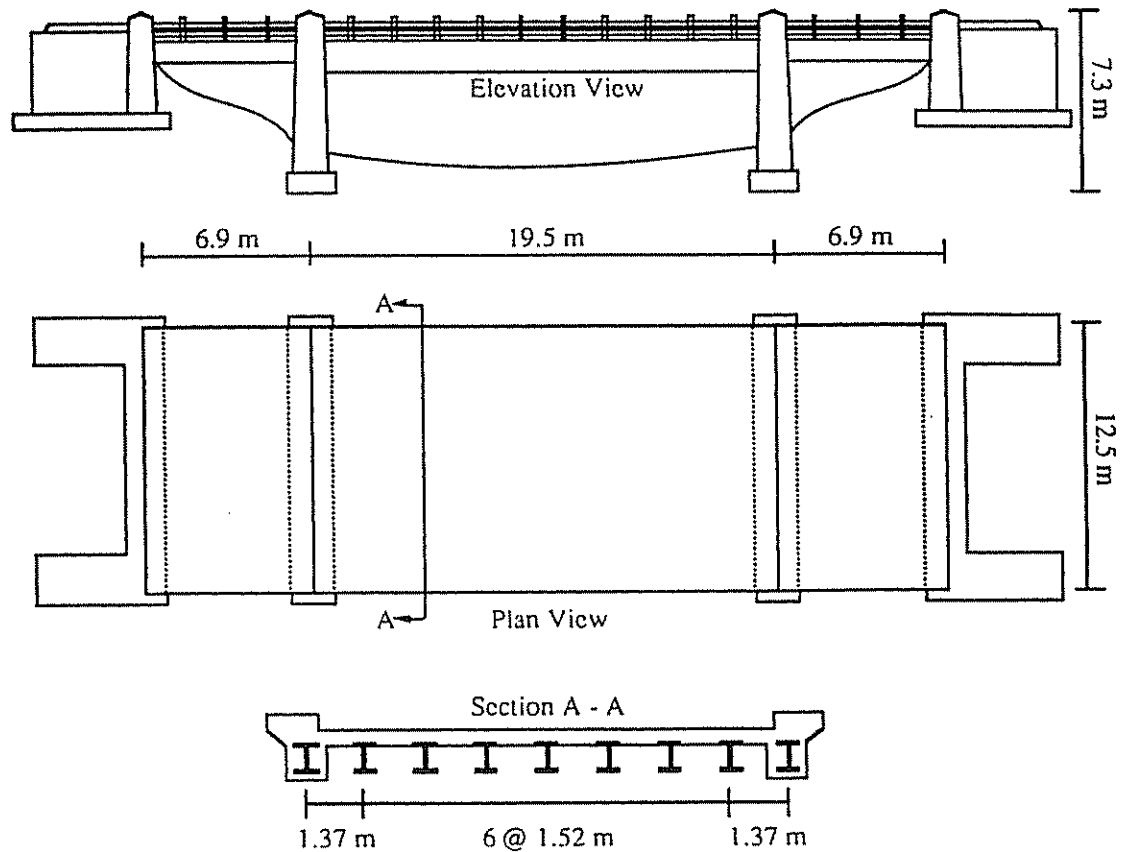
Lancaster Pike Bridge Plan and Elevation
